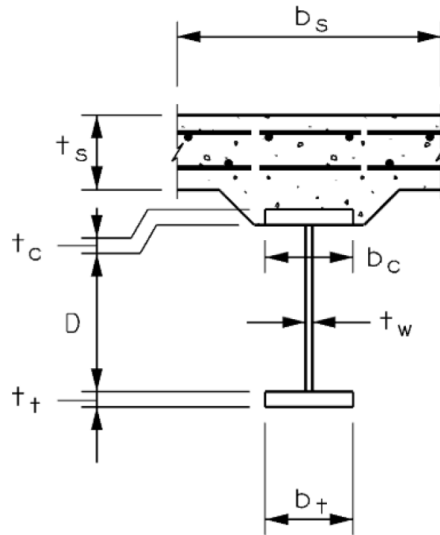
Typical Cross-Section of Isolated Composite Steel Girder (AASHTO LRFD 2010)
